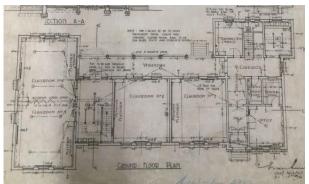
Ground floor plan, showing classrooms connected via veranda. (Source: Public Records Office of Victoria VPRS 3686-P7-2033)
